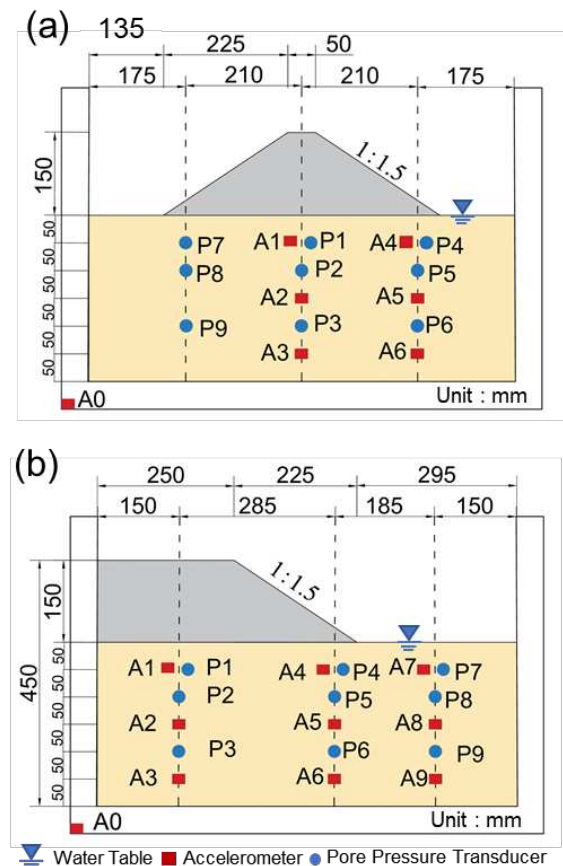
Model geometries and instrumentations: (a) full-cross-section dam model; (b) half-cross-section dam model.
